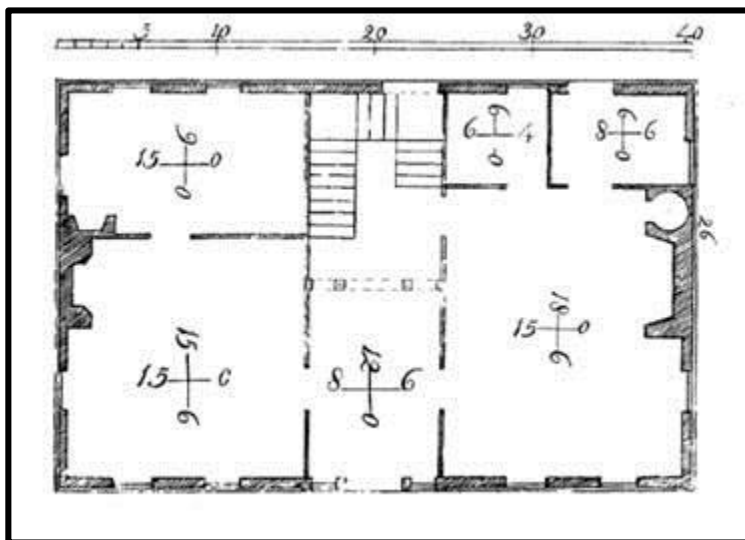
Asher Benjamin floor plan, as published in the Country Builder's Assistant in 1797.
